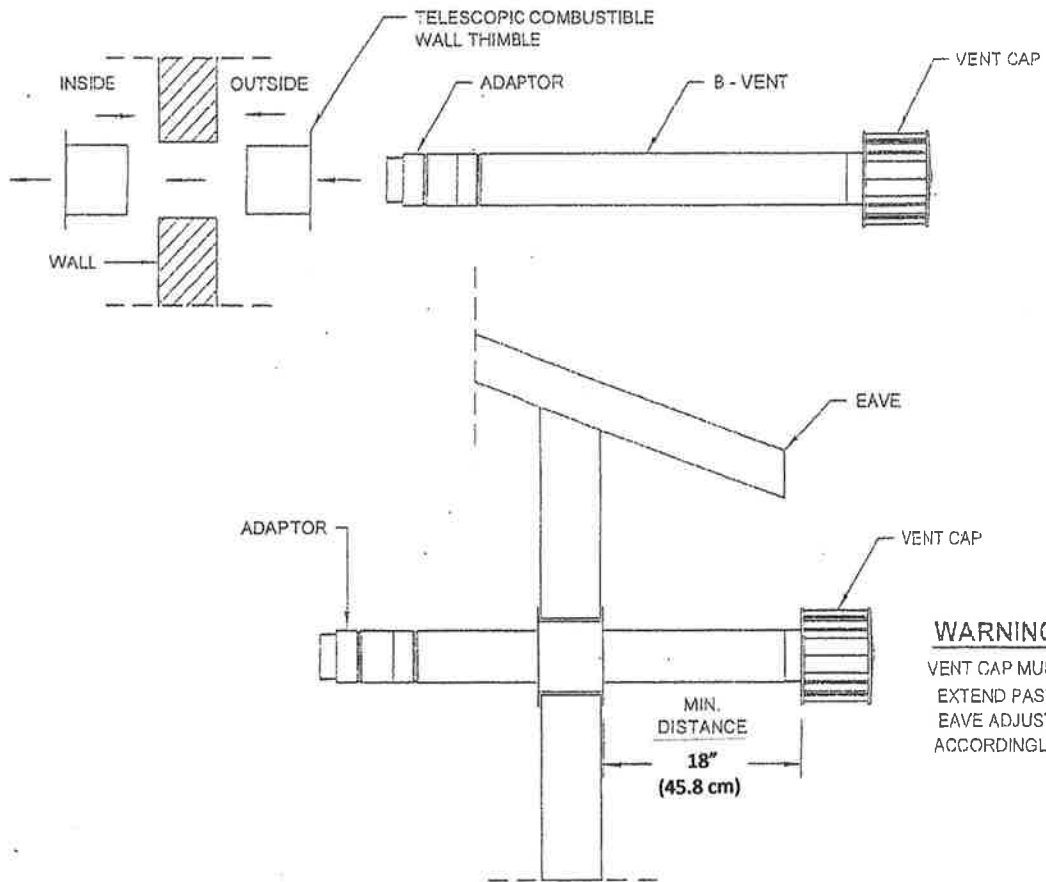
SIDE WALL VENT KIT INSTALLATION
